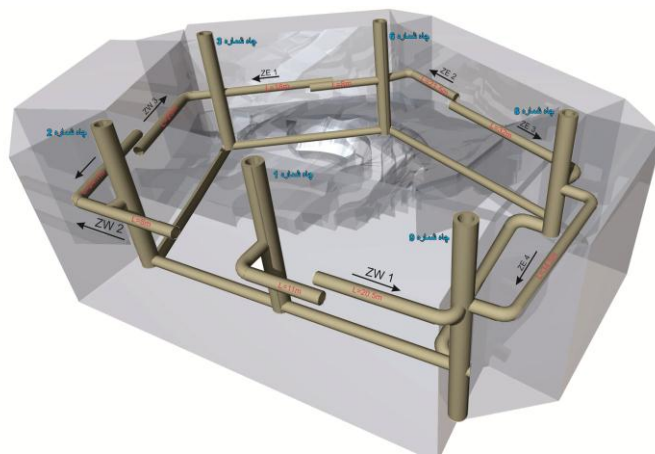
The layout of drainage wells and the inter-connection tunnels
